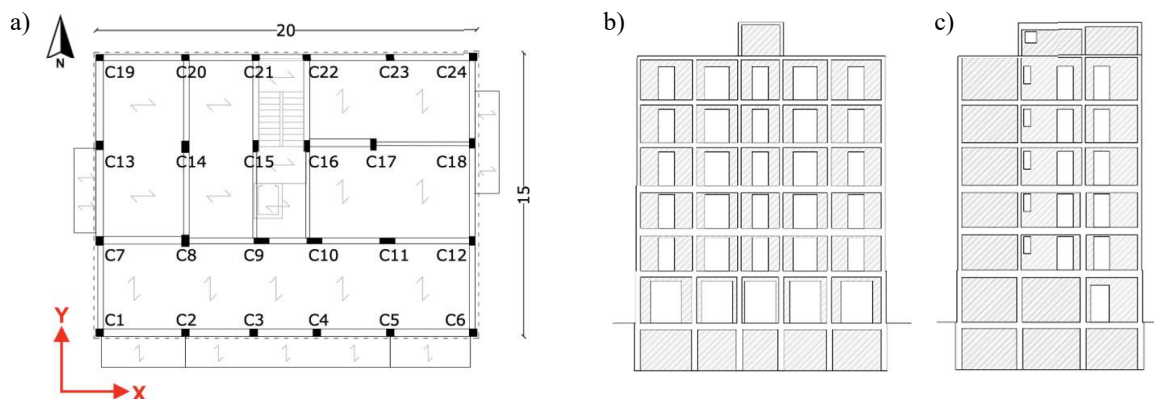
a) Ground floor structural plan, b) south and c) east elevation views of case study building.
